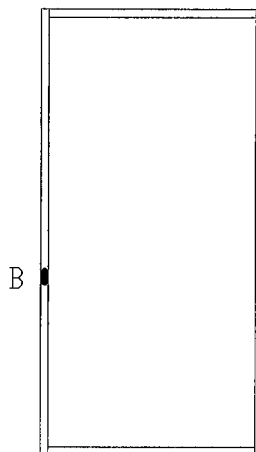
Deflection Gage Locations for the Uniform Static Load Test (longest fastener span)
